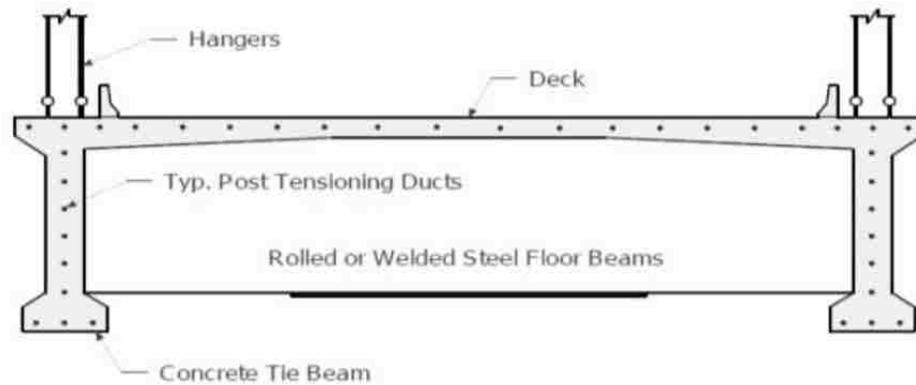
Alternate Cross Section from Hall and Lawin (1985)
